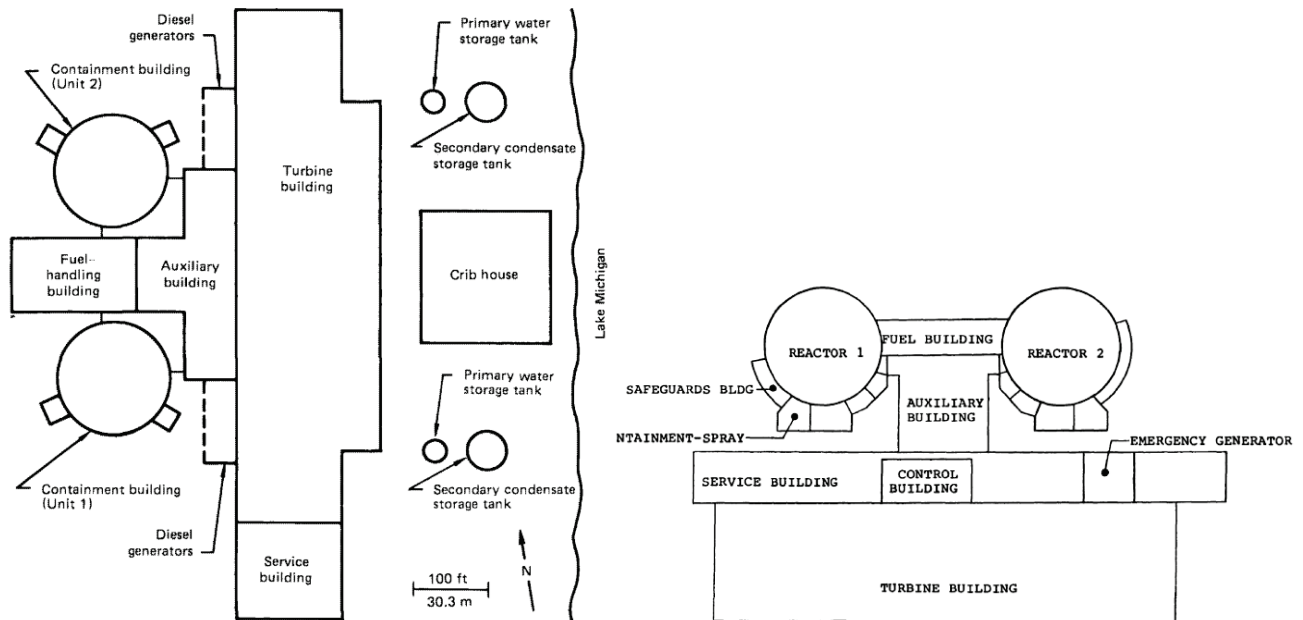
Site plan of Zion (left) and Surry (right) nuclear power stations (Smith et al. 1981, and Bohn et al. 1987).
